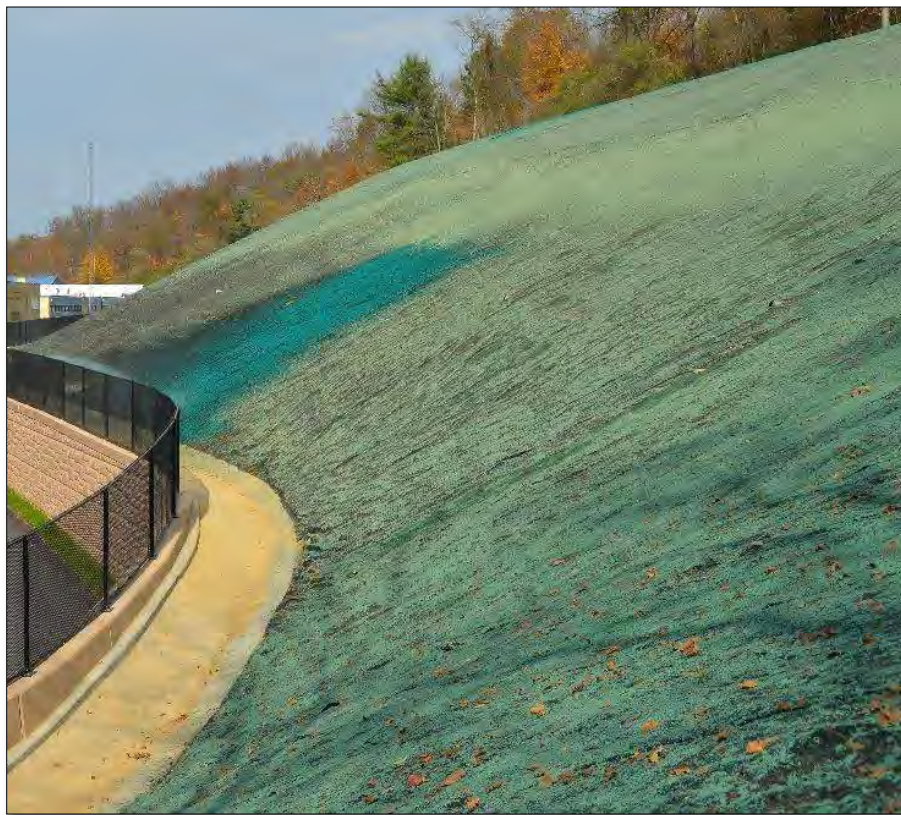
Turf Reinforcement and Hydroseed to Installed Repair and Stabilize Slope
